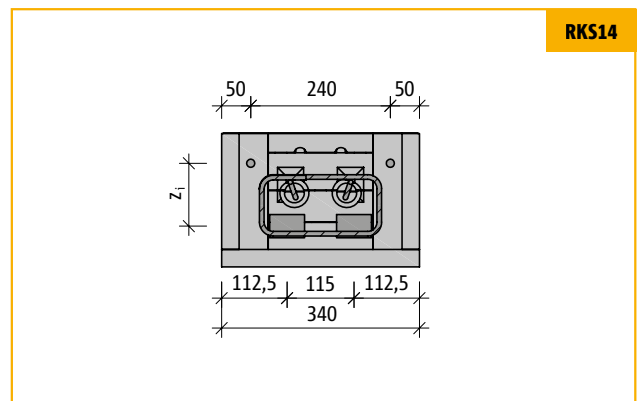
Side elevation from inside: Schöck Isokorb® type RKS14
